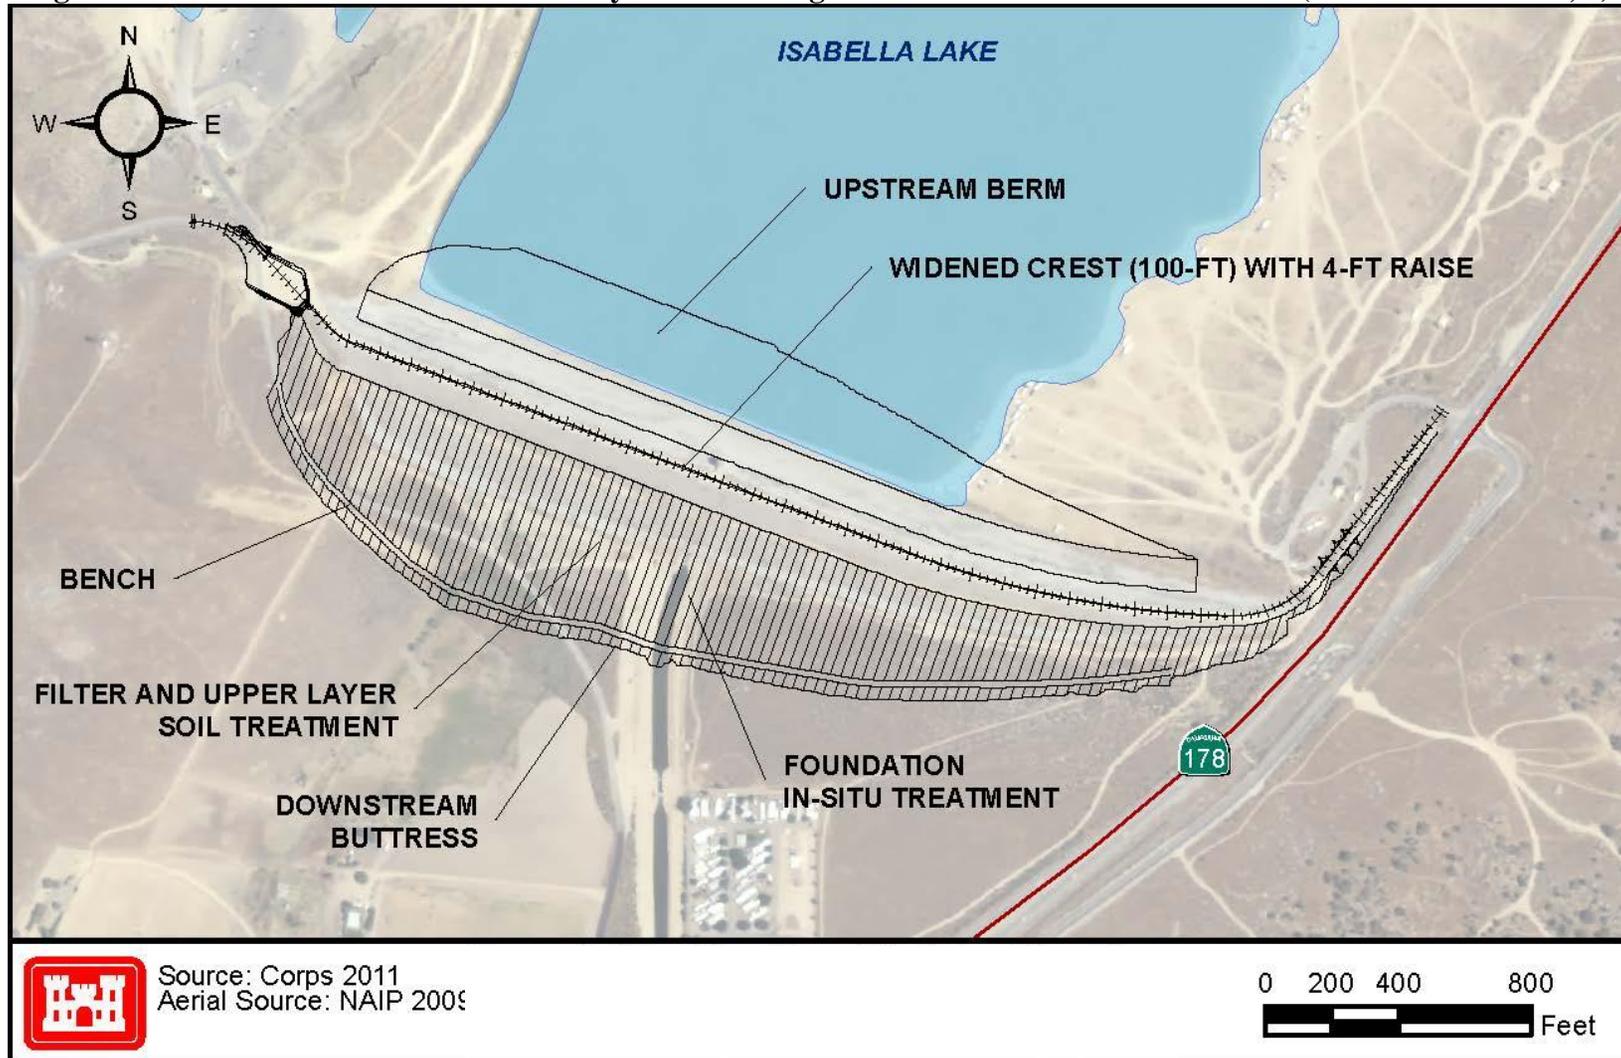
Plan View Sketch of Auxiliary Dam Showing Full Set of Remediation Measures (Alternative Plans 2, 3)
